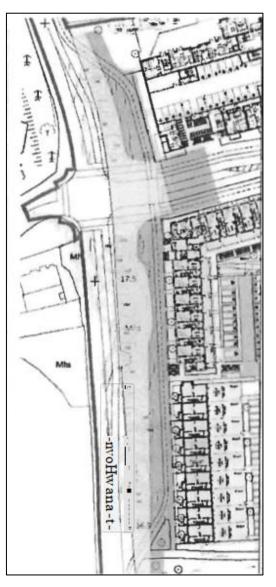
Extract from the Objection showing the Proposed Scheme over the Development Plan
